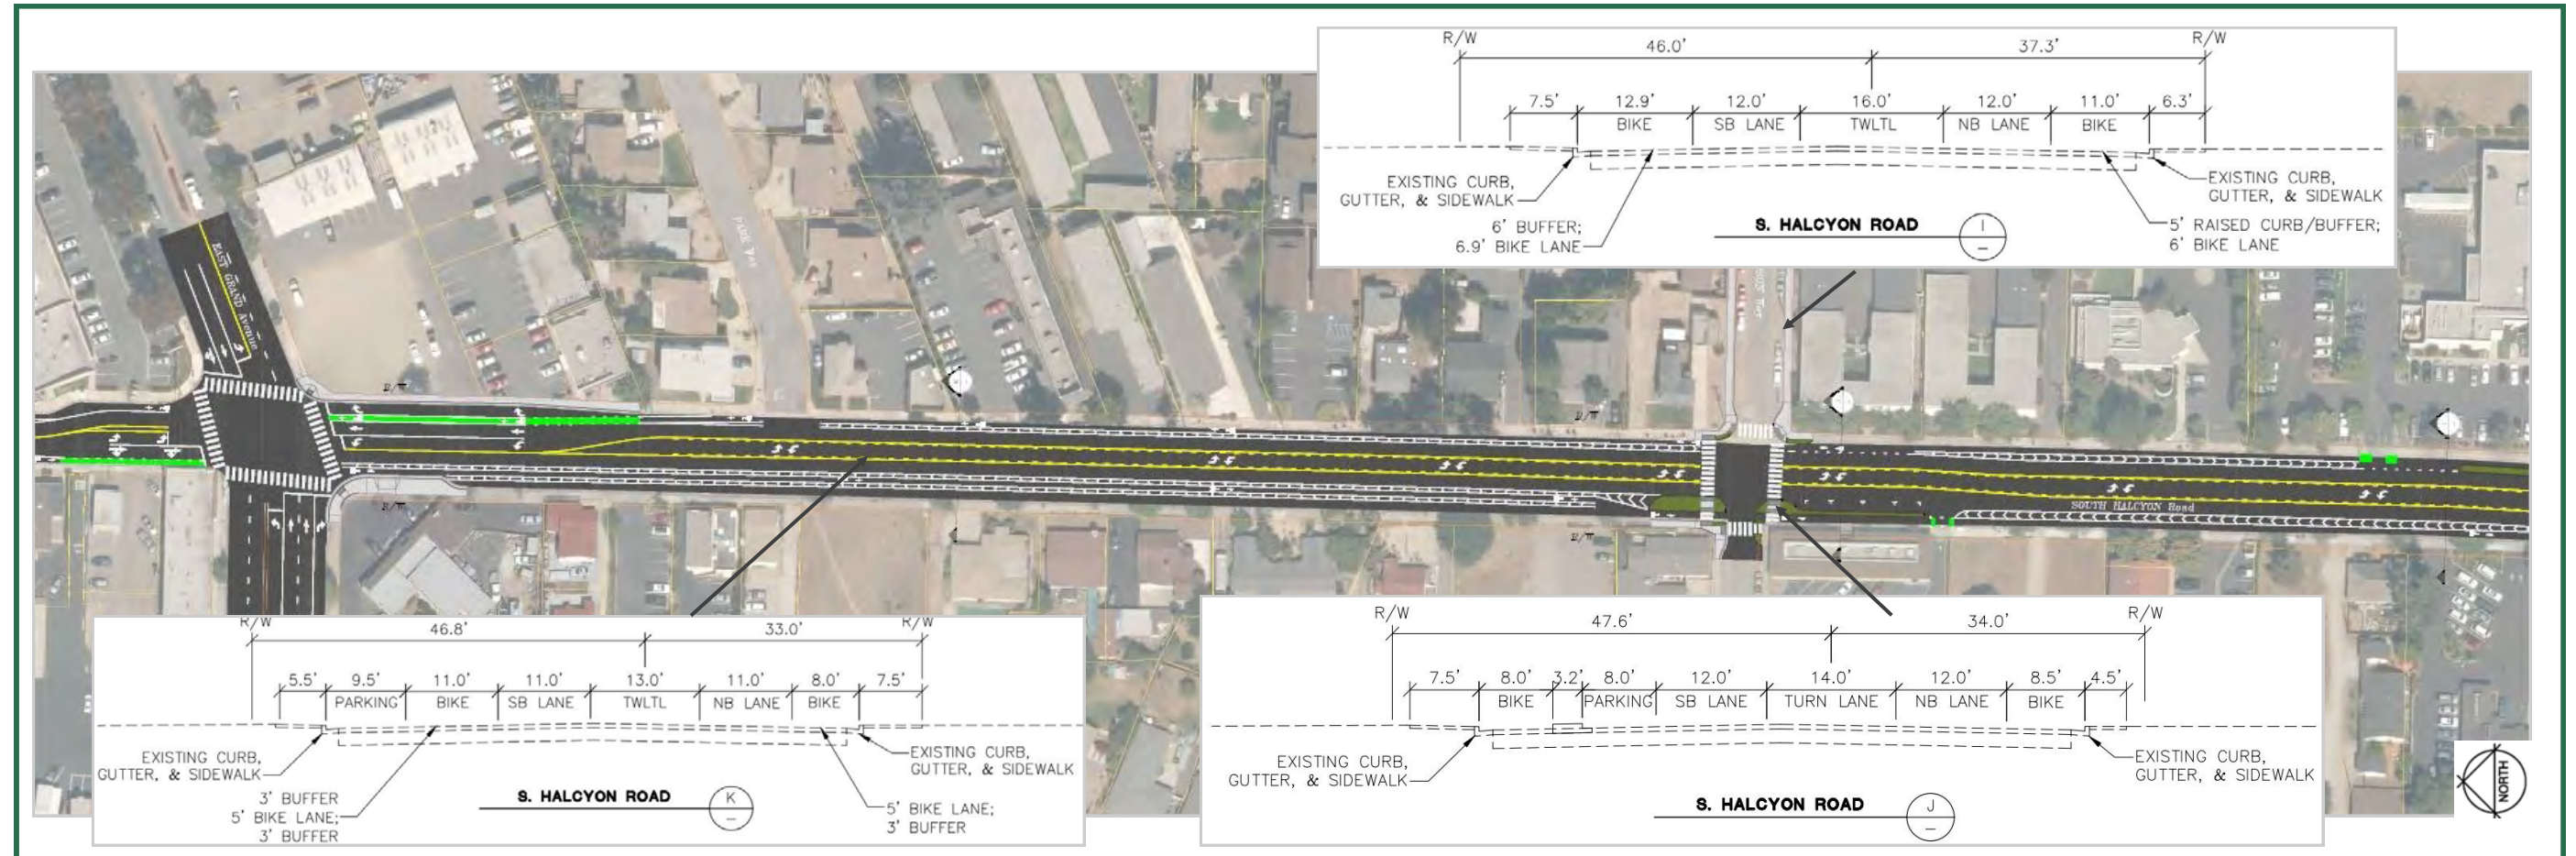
B - Recommended Context Zone 2: Section 2 Plan
